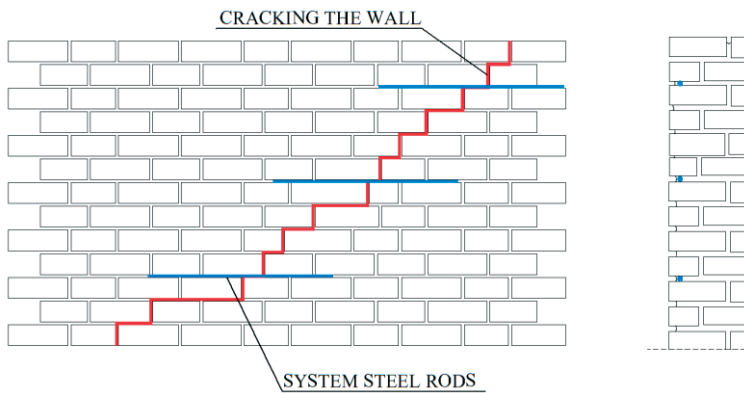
Scheme of the wall's structure repair by using system steel rods
